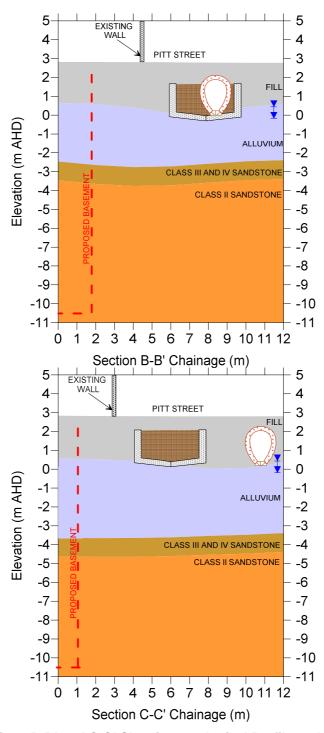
Cross Sections B-B' and C-C' Showing Geological Profile and Tank Stream Through the Proposed Basement Wall Adjacent to Pitt Street
